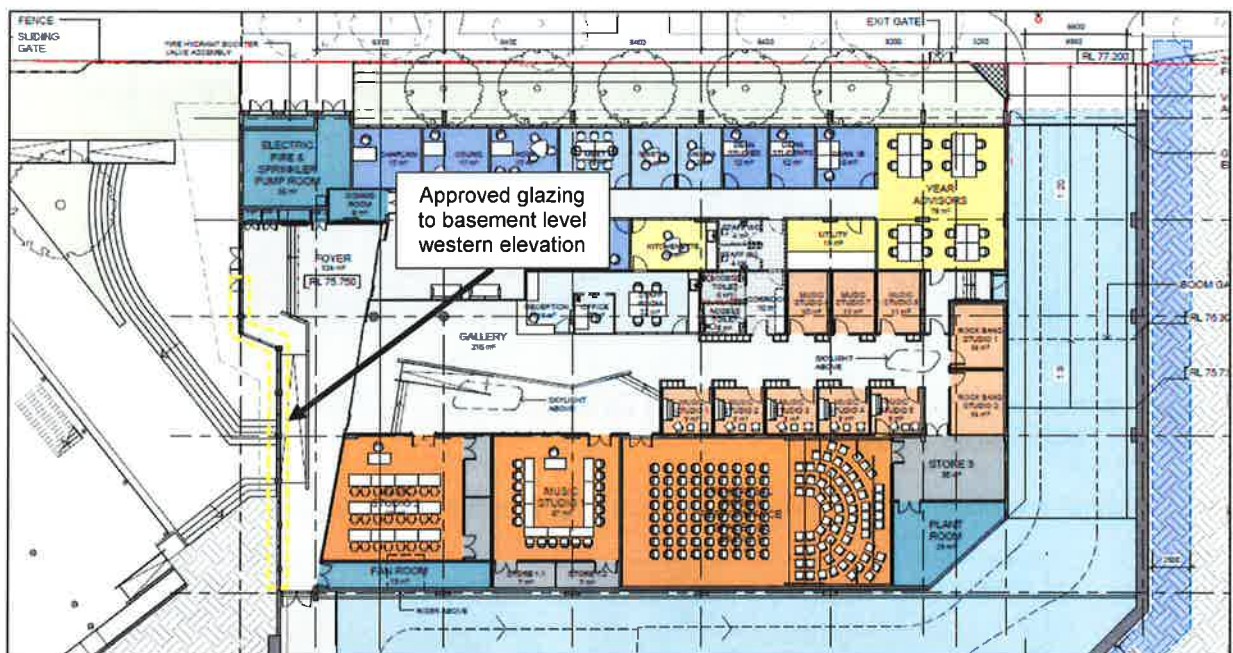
Foyer glazing to west elevation of interim music hub as approved (shown dashed in yellow, Source: Originally approved plans for SSD 6564)
